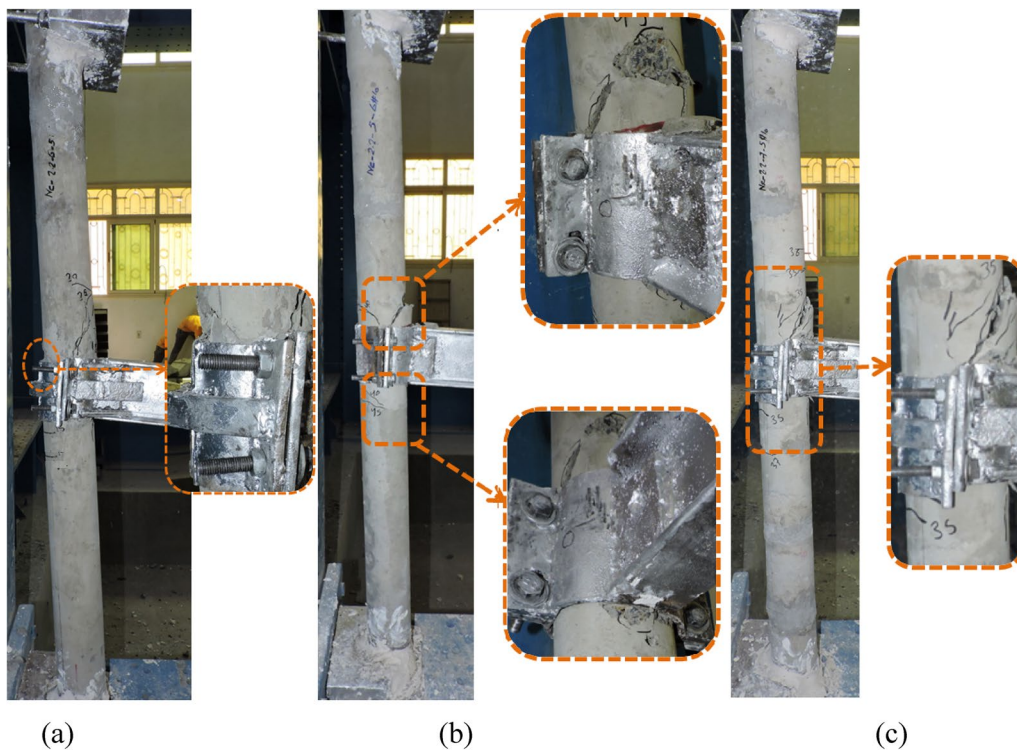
Crack pattern and failure mode G3 specimens: a NC-2.2-181; b NC-2.2-167, and c NC-2.2-142
